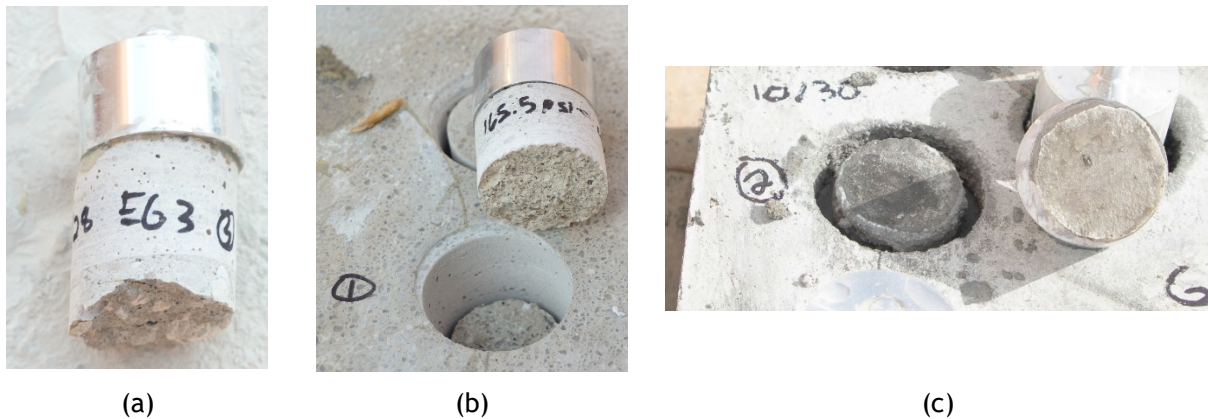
Pull-off Test Failure Modes: (a) concrete tensile failure, (b) grout-concrete interface failure, and (c) epoxy adhesion failure
